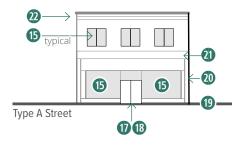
Commercial Storefront Building Plan: Building Siting Requirements
